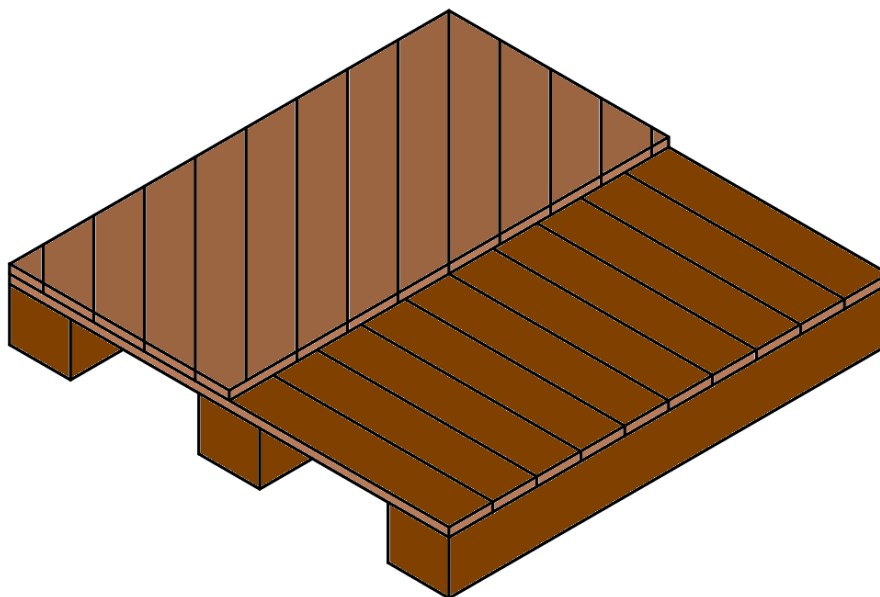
Reinforced timber floor by adding a second layer of timber boards.
